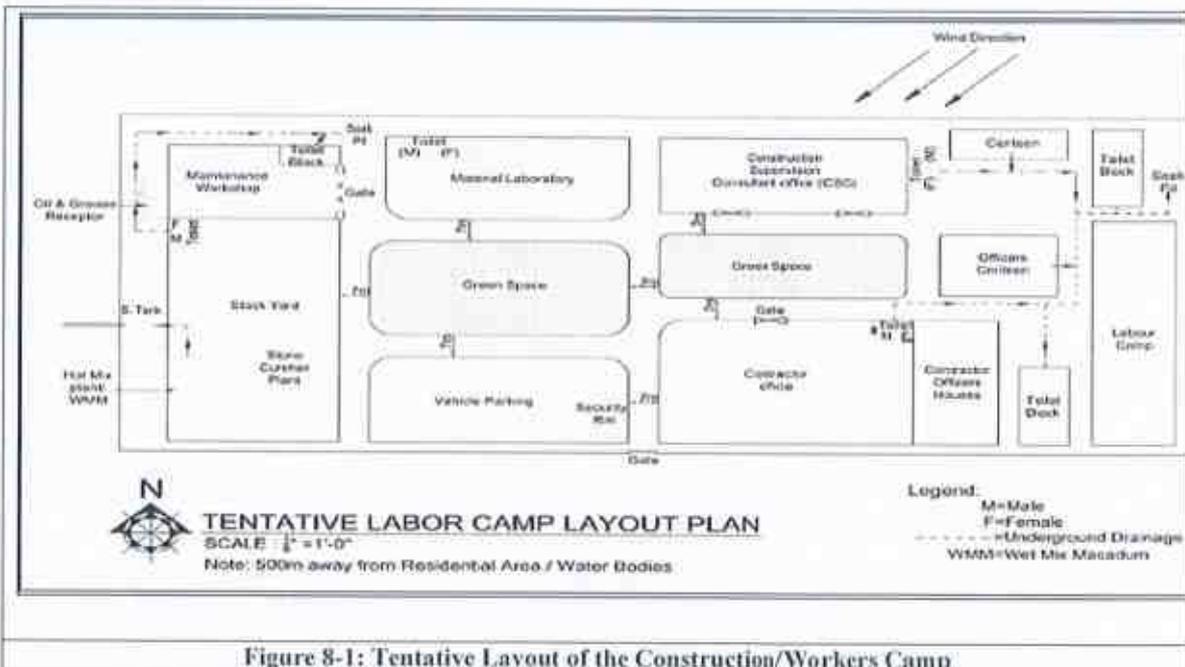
Tentative Layout of the Construction/Workers Camp
